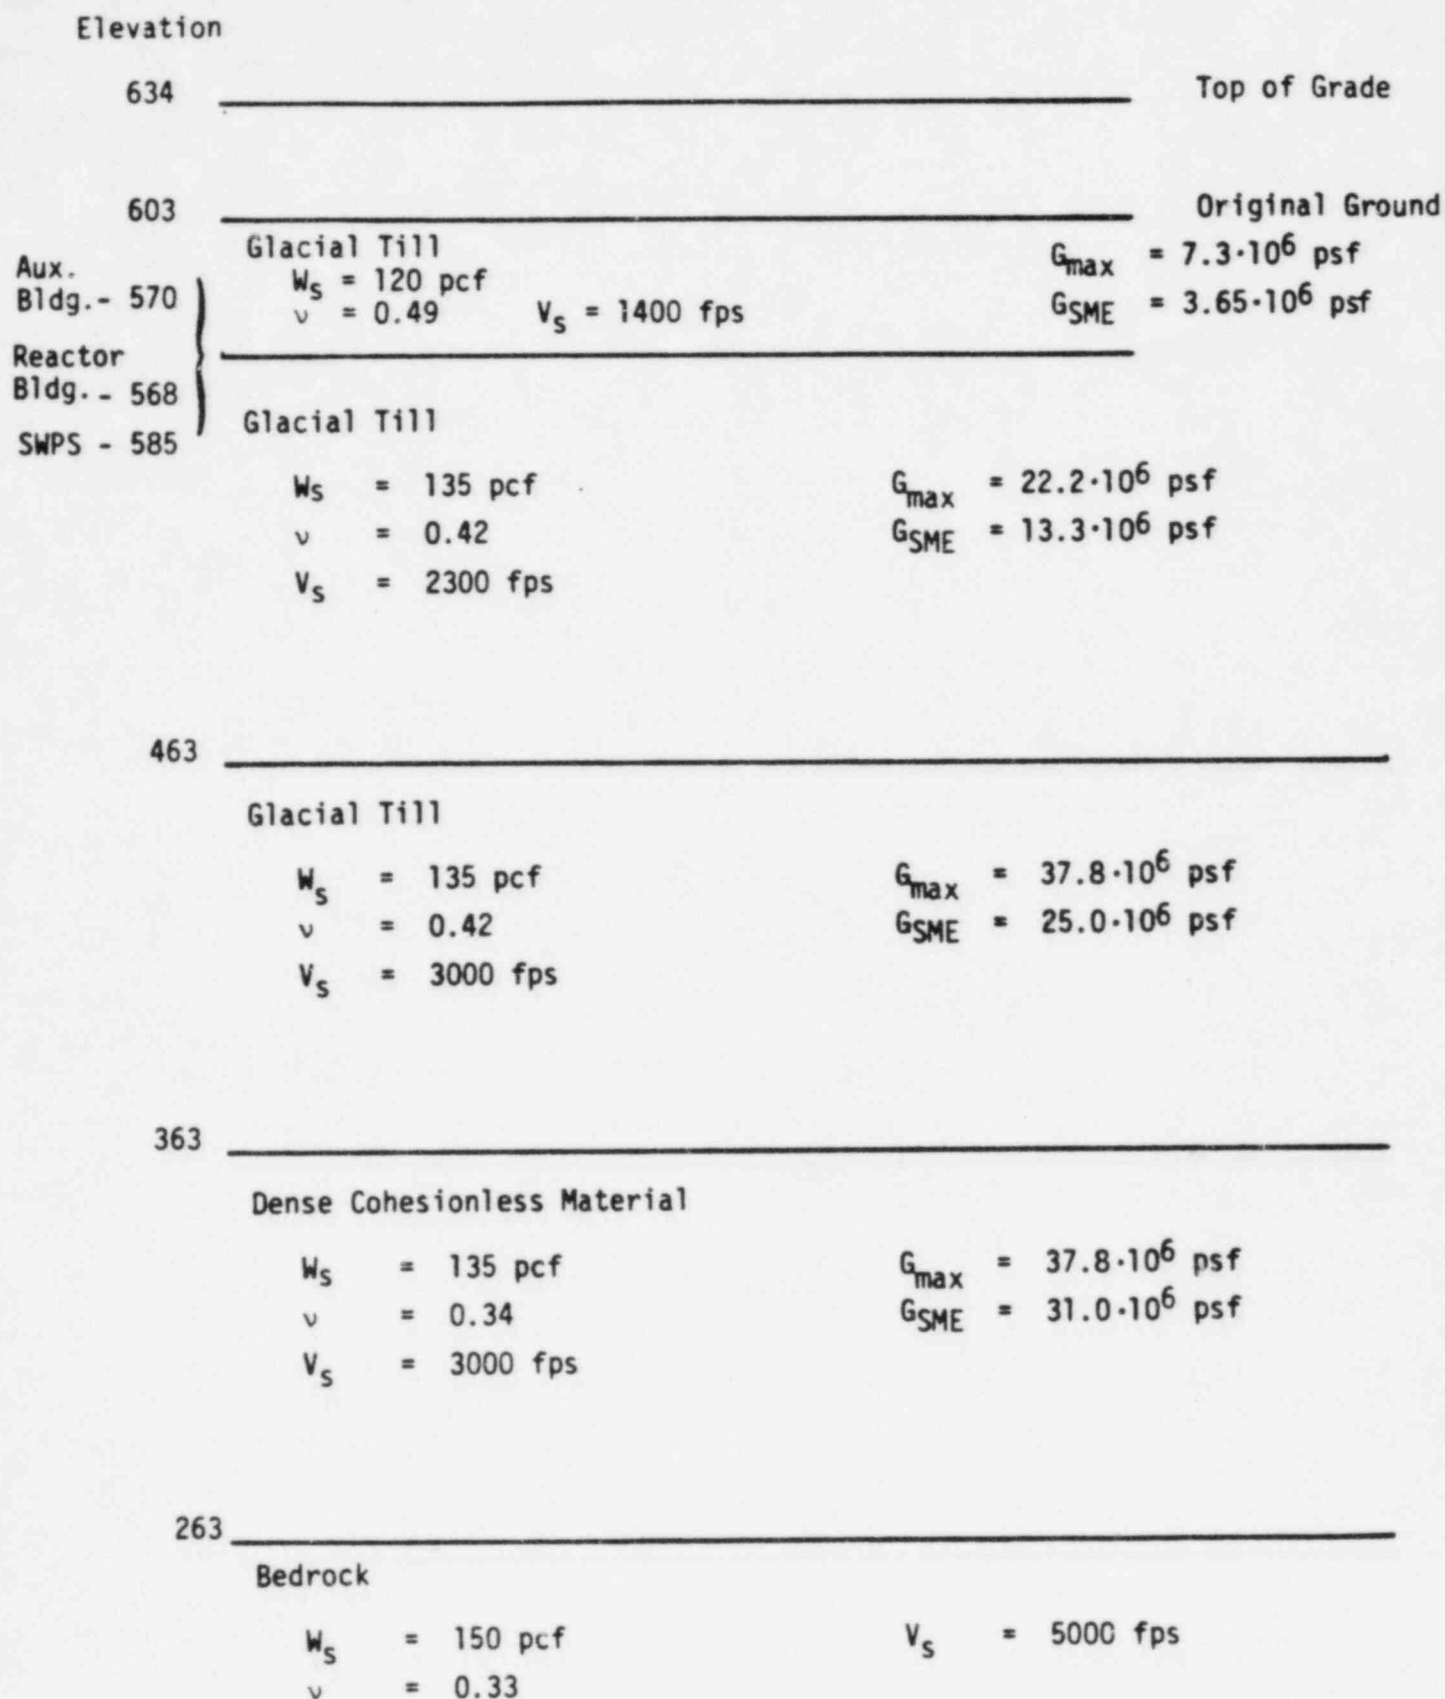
SOIL LAYERING PROFILE FOR STIFF SITE
